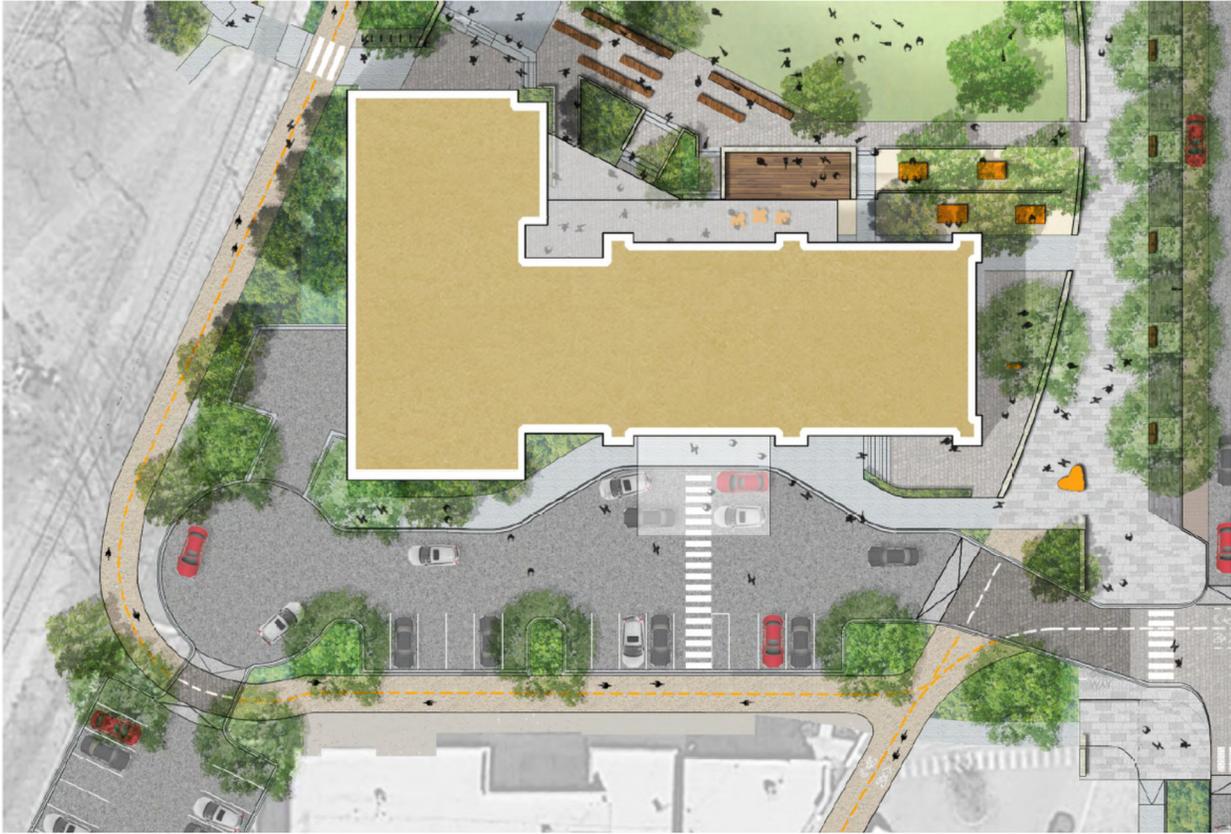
EXHIBIT F: DIAGRAMMATIC PLAN OF GROUND FLOOR SPACES
